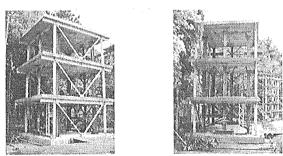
'Weak' structural model constructed on the actual ground at Chiba Experiment Station
